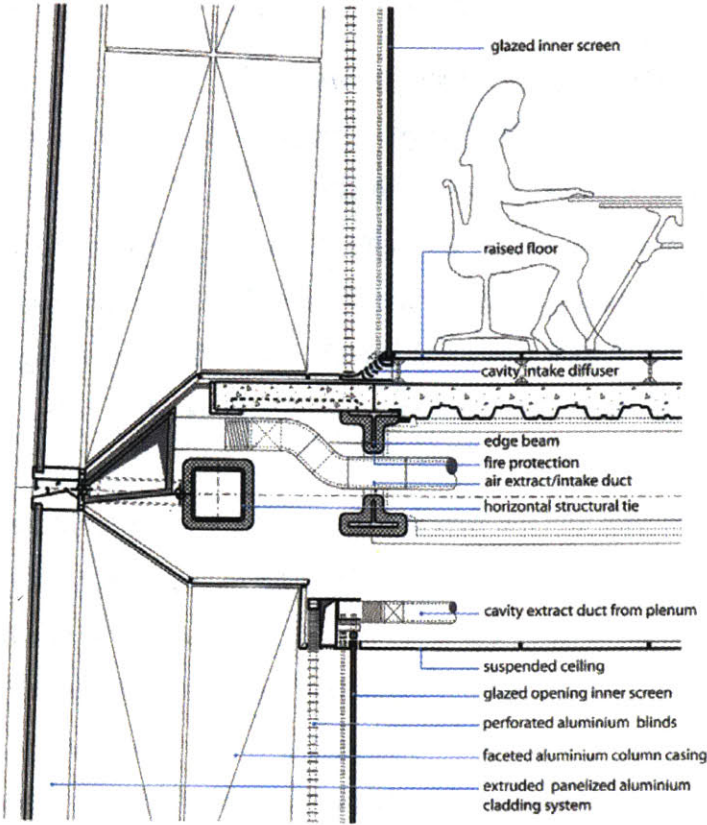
Section showing ventilated façade and air intake at the plenum. (Source: Amelar)
